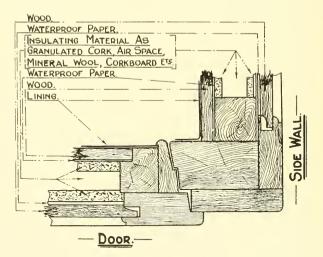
TYPICAL REFRIGERATOR WALL AND DOOR CONSTRUCTION.
